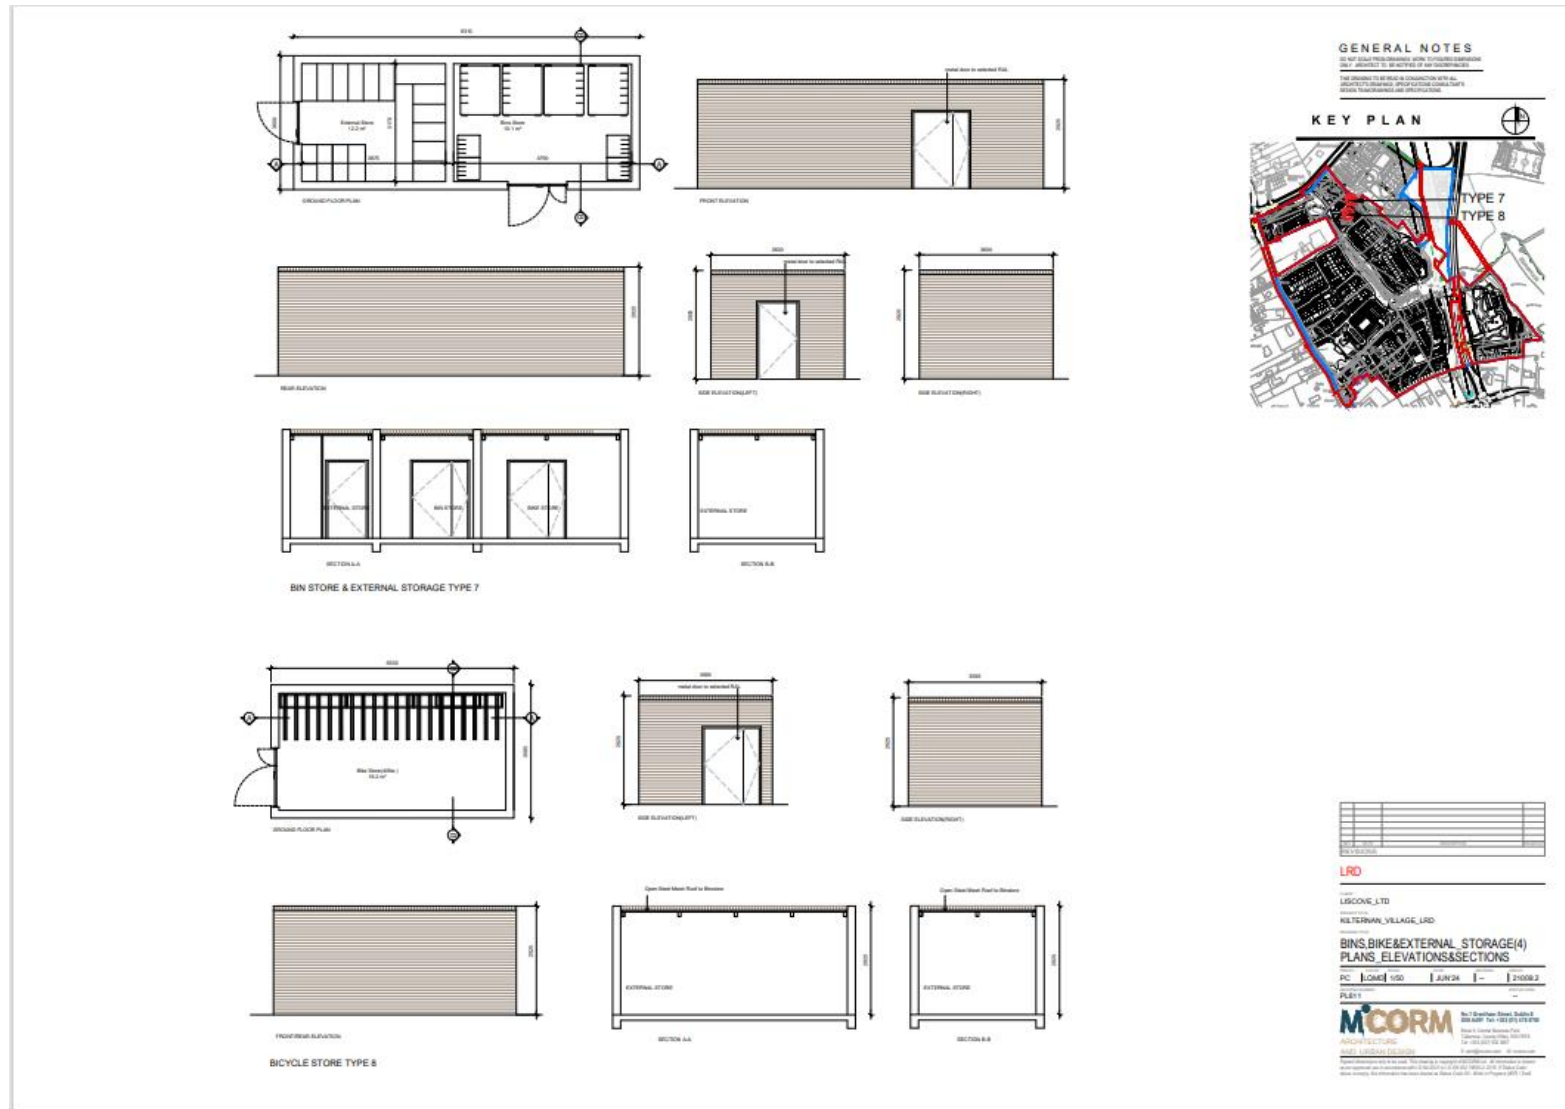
Internal Layout of Waste Storage Area Type 7 and 8
